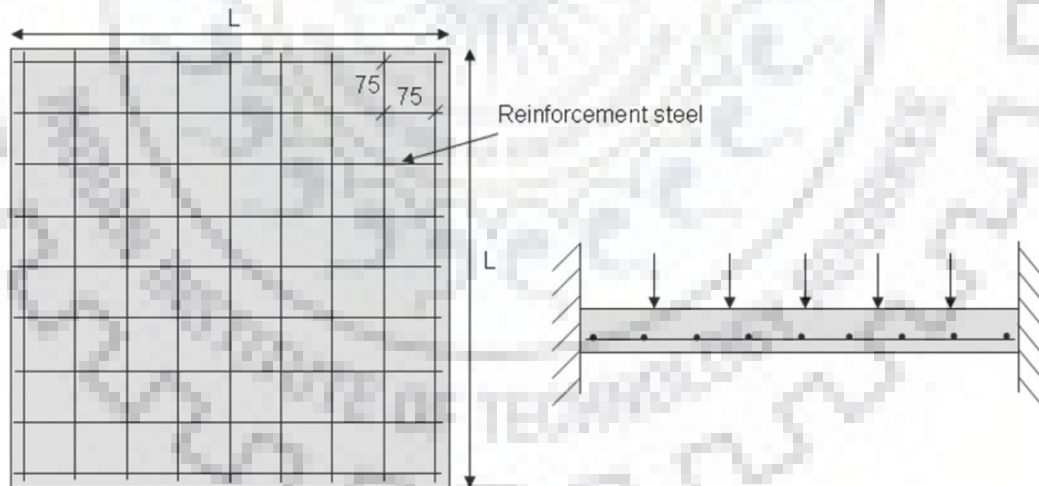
Wang et al. details of slab, reinforcement and support conditions
